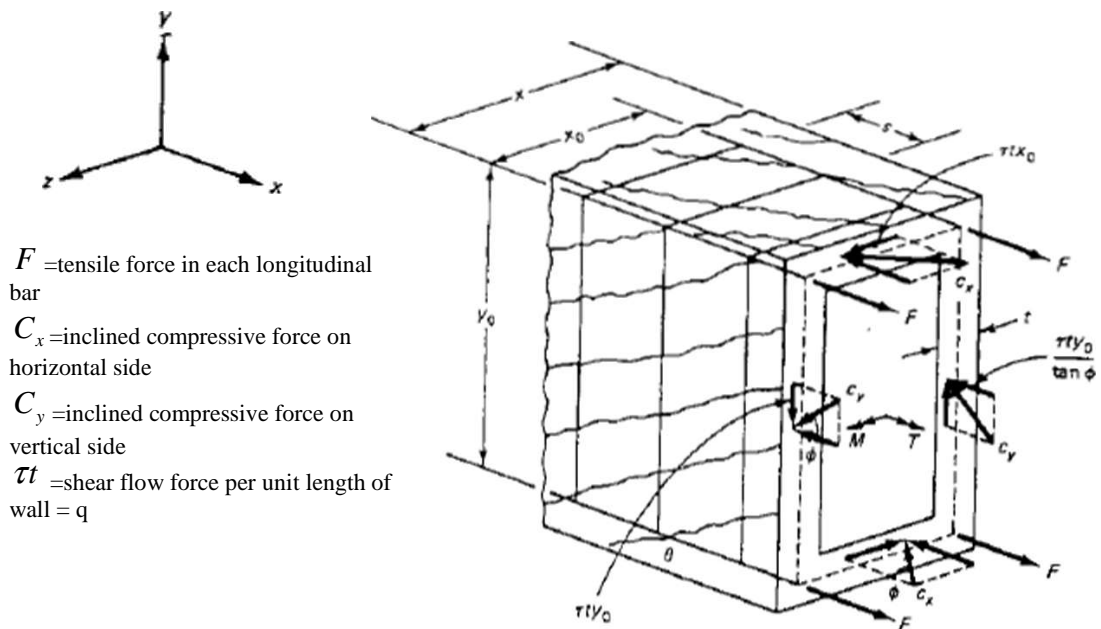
Forces on hollow box concrete surface by truss analogy (Nawy,2005).
